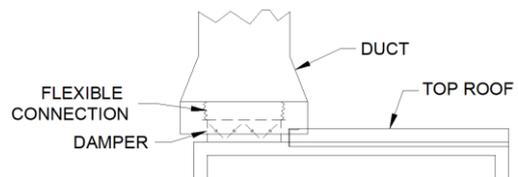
Side view of Return duct to be large enough to cover exposed area
